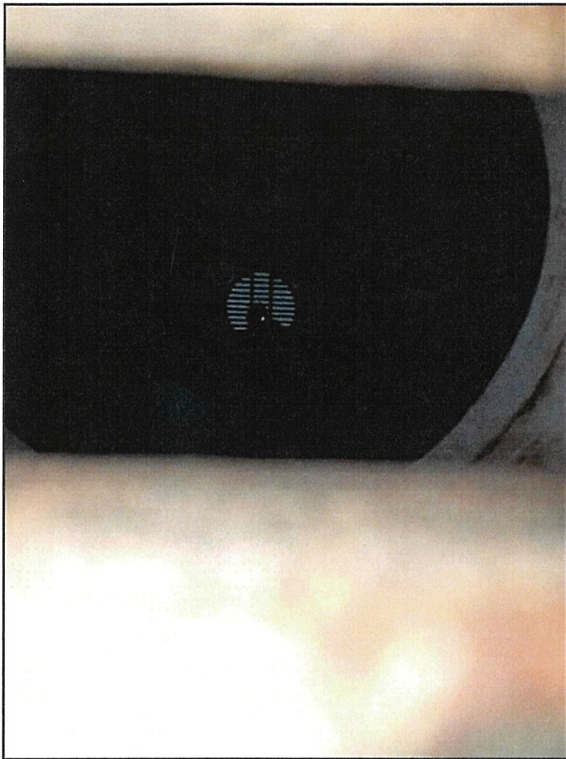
TP-1 STANDING WATER WITHIN DRYWELL
